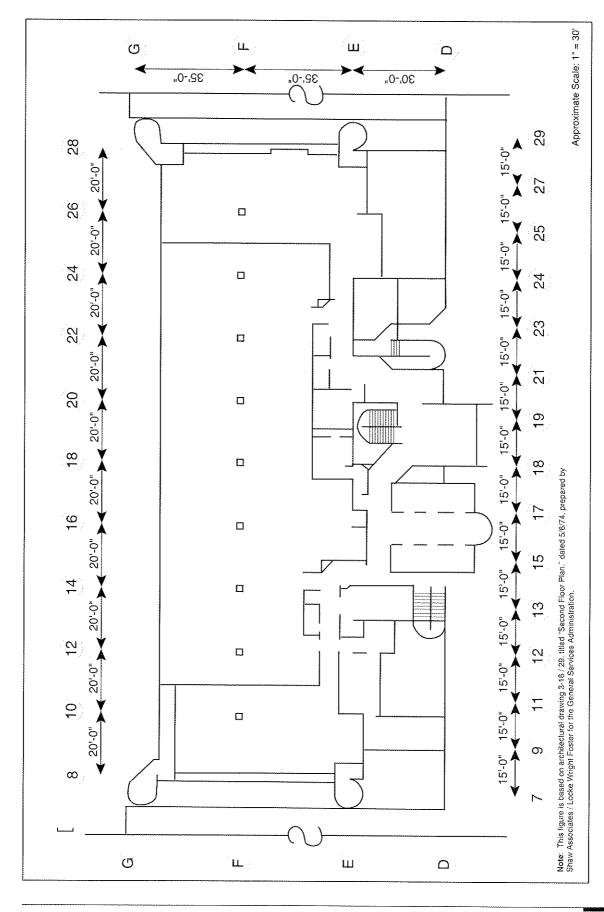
Floor plan – second floor of nine-story portion of Murrah Building.
